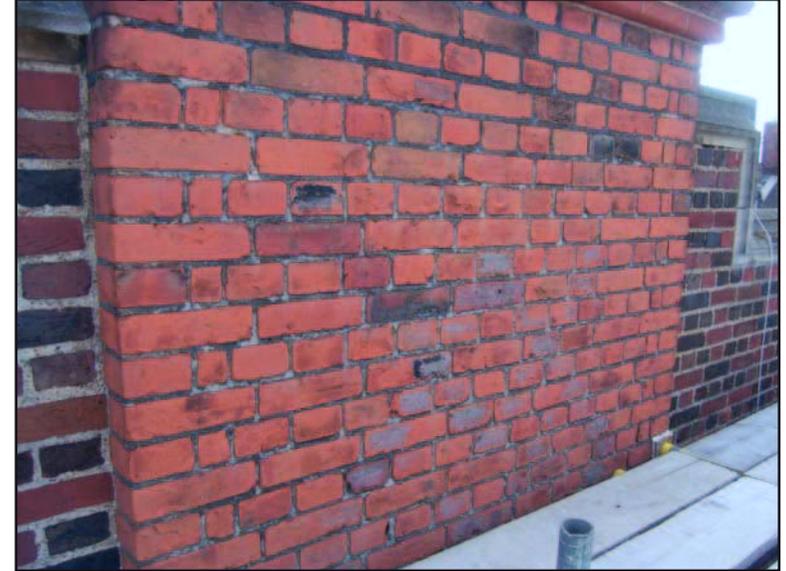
Victorian diaperwork on north elevation chimney type T bricks
